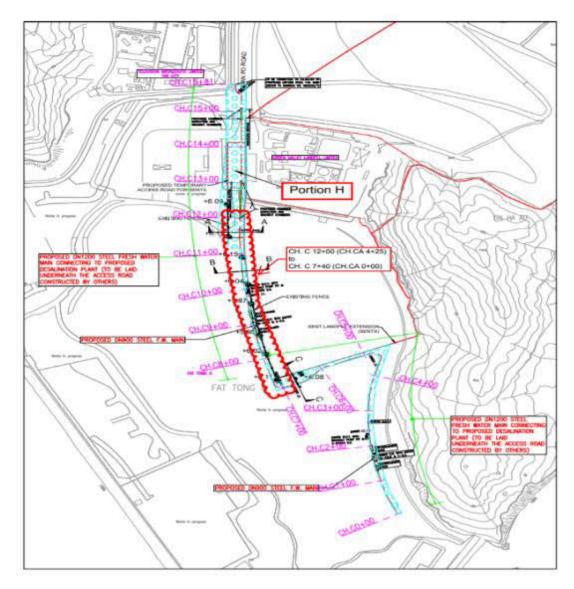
Location Plan for Portion H– CH.C 7+40~CH.C 12+00 (CH.CA 0+00 ~ CH.CA4+25)
